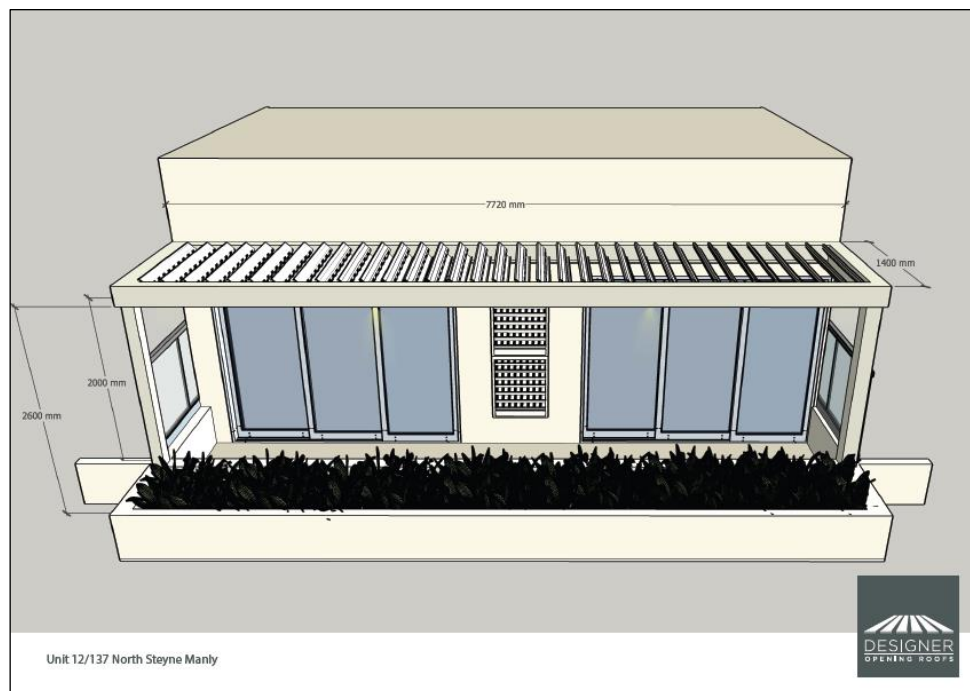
3D rendering (Source – Designer Opening Roofs: 2024)
